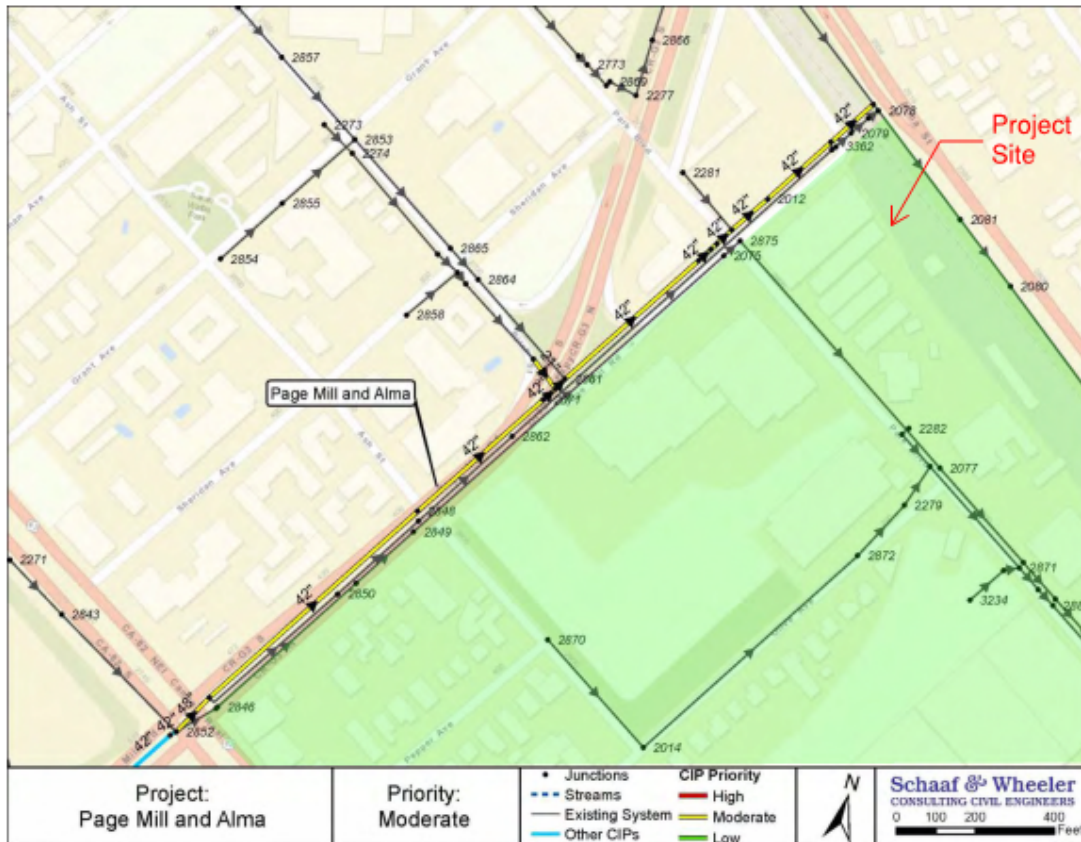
Recommended Page Mill Road Storm Drain Improvements
